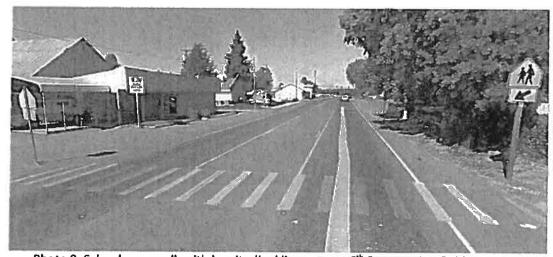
School crosswalk with longitudinal lines across 6th Street at Los Robles Avenue
